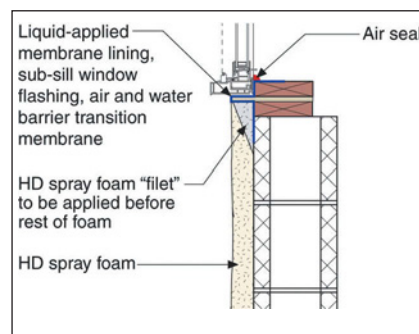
Masonry Wall Sill Detail – Wood buck with plywood lip creates under window gutter. Note the foam "fillet" picture framing the opening.
